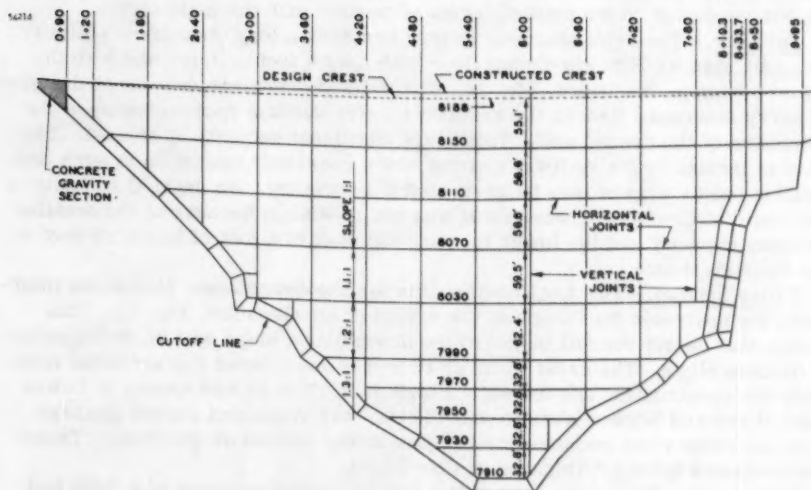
DEVELOPED VIEW OF FACE - COURTRIGHT DAM
